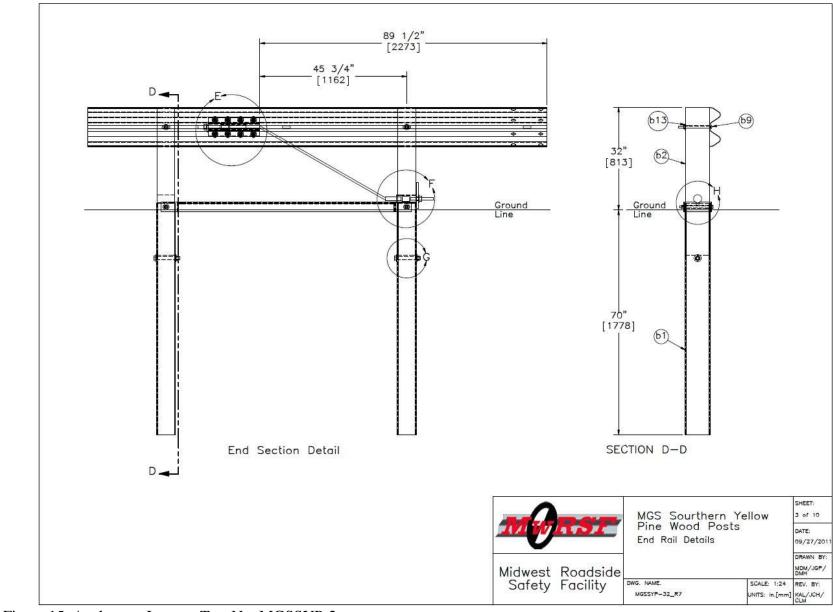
Anchorage Layout, Test No. MGSSYP-2
